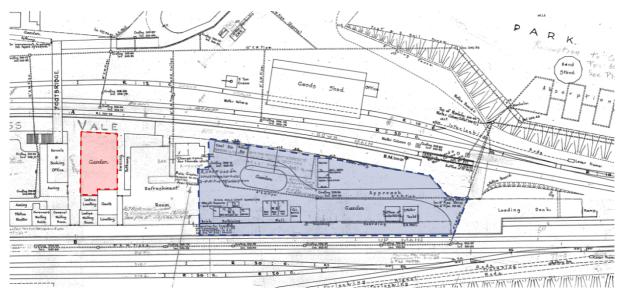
Plan of the 1915 rail duplication works showing the Courtyard (in red) and Refreshment Rooms gardens (in blue). (Source: CMP, 2020)
